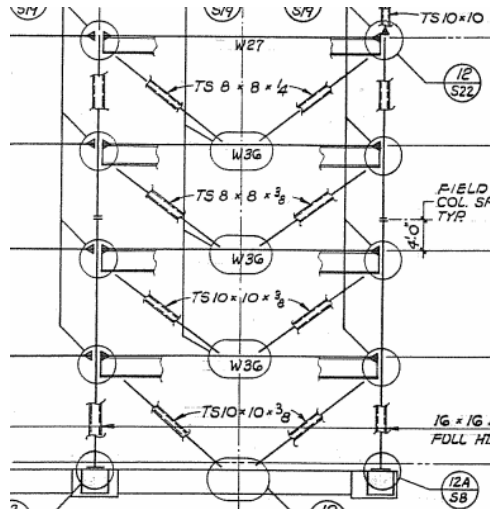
Frame Elevation (80CA4A--2-AB-2)
